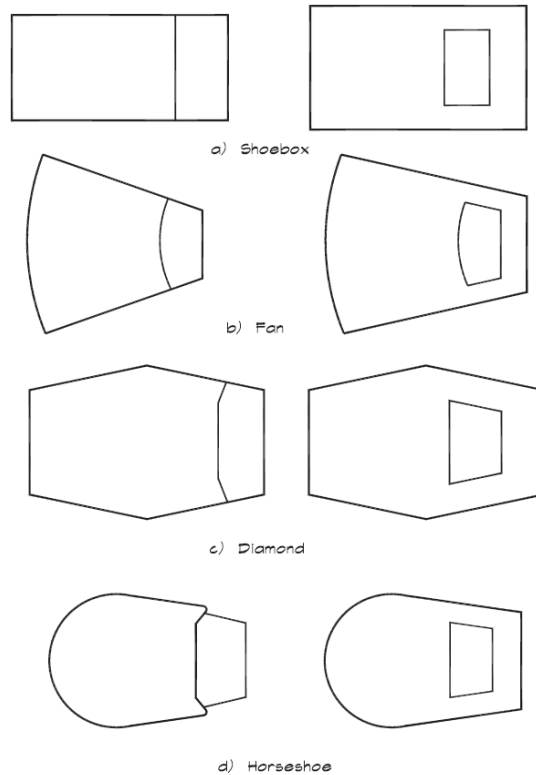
Basic floorplans for concert halls in normal (left) and surround (right)
